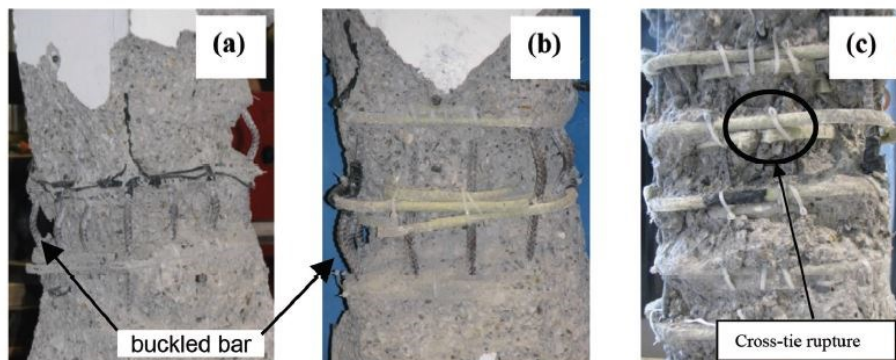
Failure hybrid-reinforced column under axial compression (Tobbi et al. 2014a)
